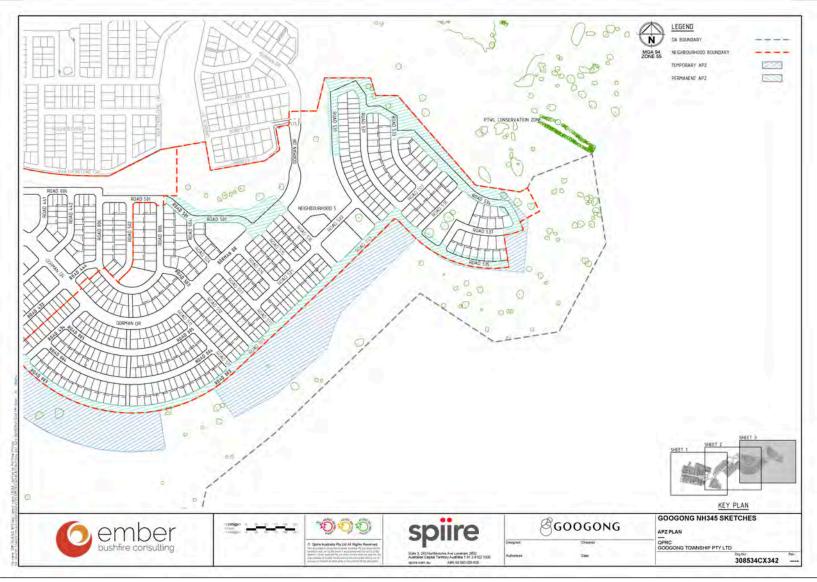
APZ plan for NH 3. (Ember & Spiire, 2021)
